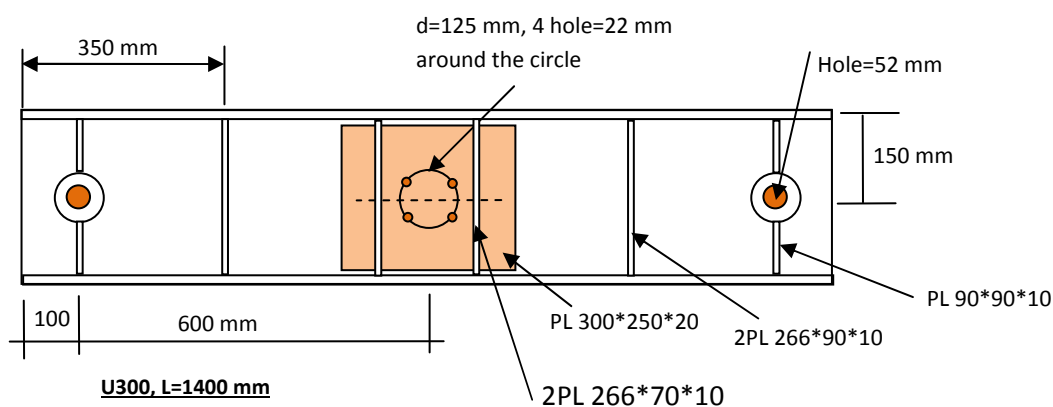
B. 5 Detail of supporting beam at the middle joint and top of screw jack
